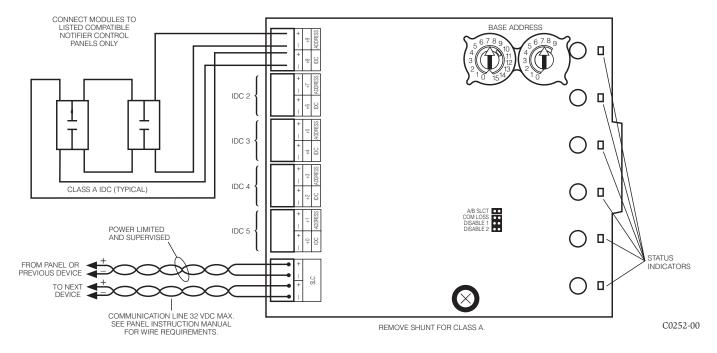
TYPICAL FAULT TOLERANT INITIATING DEVICE CIRCUIT CONFIGURATION - CLASS A, STYLE D:
